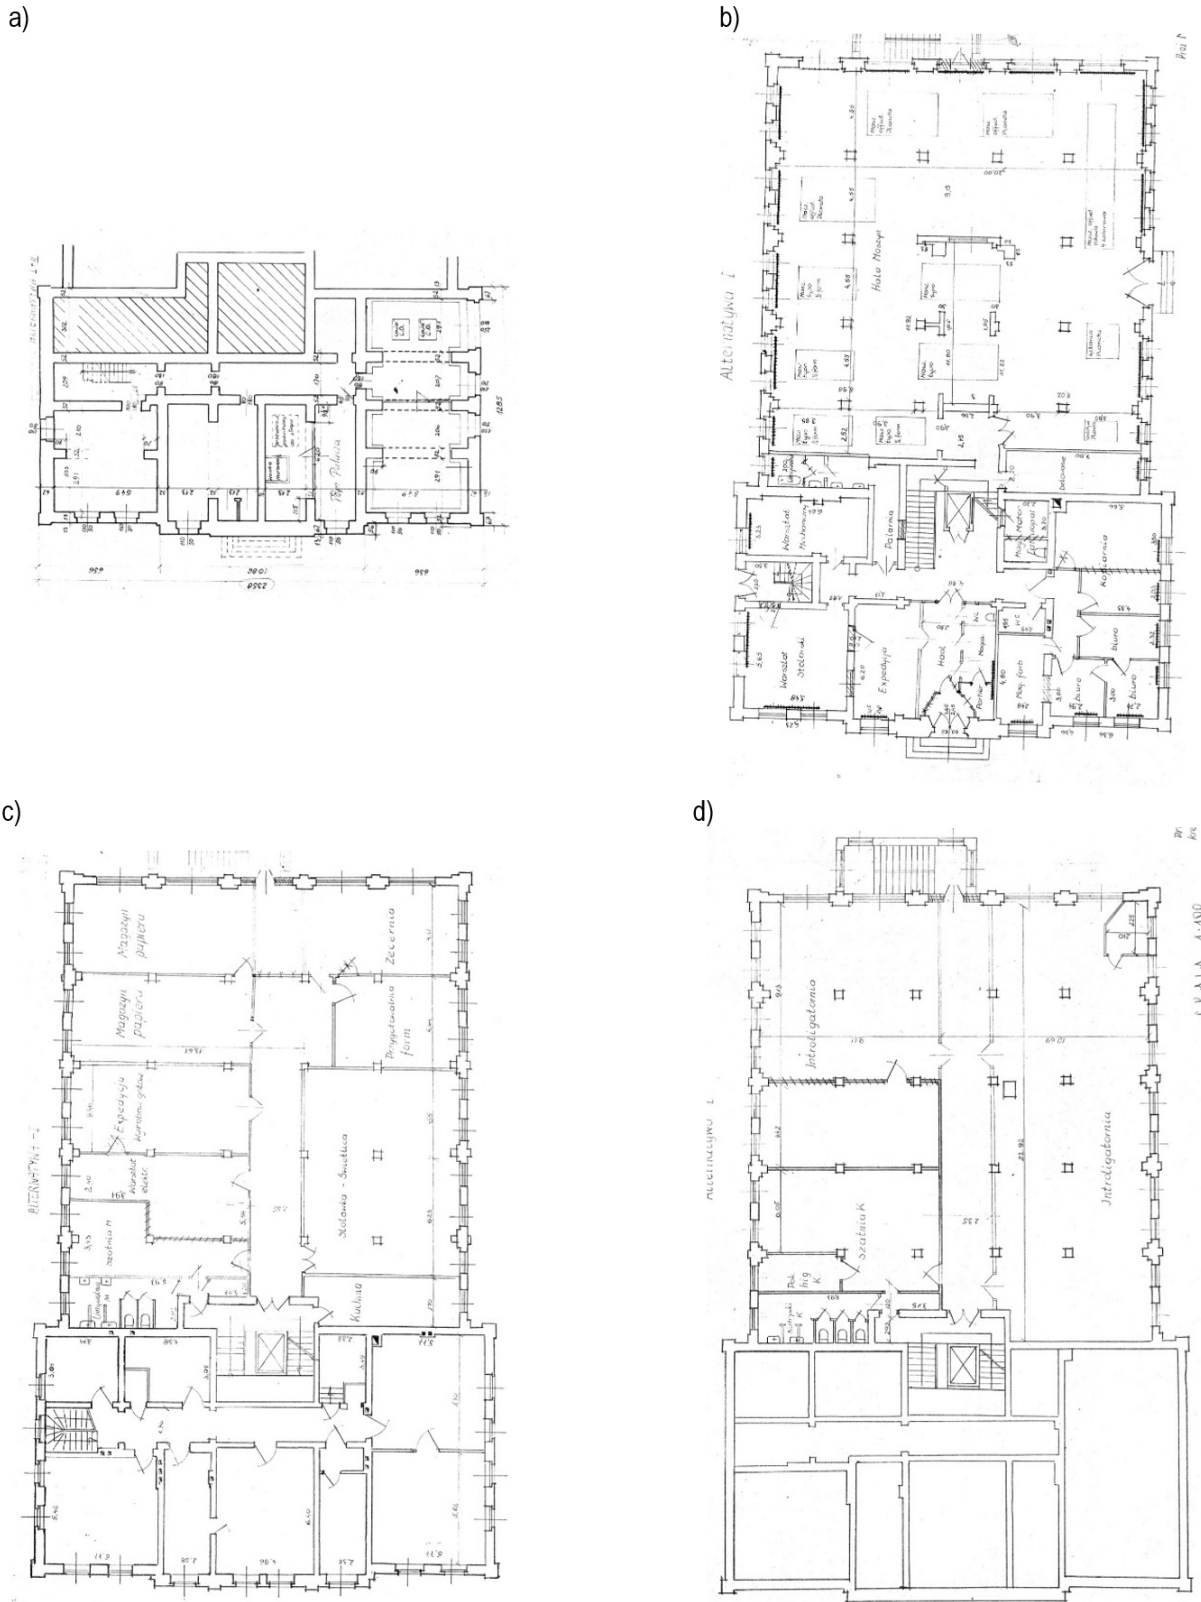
Building planned for modernization - projection of: a) basement, b) ground floor, c) 1st floor, d) 2nd floor (based on the archival construction inventory)
